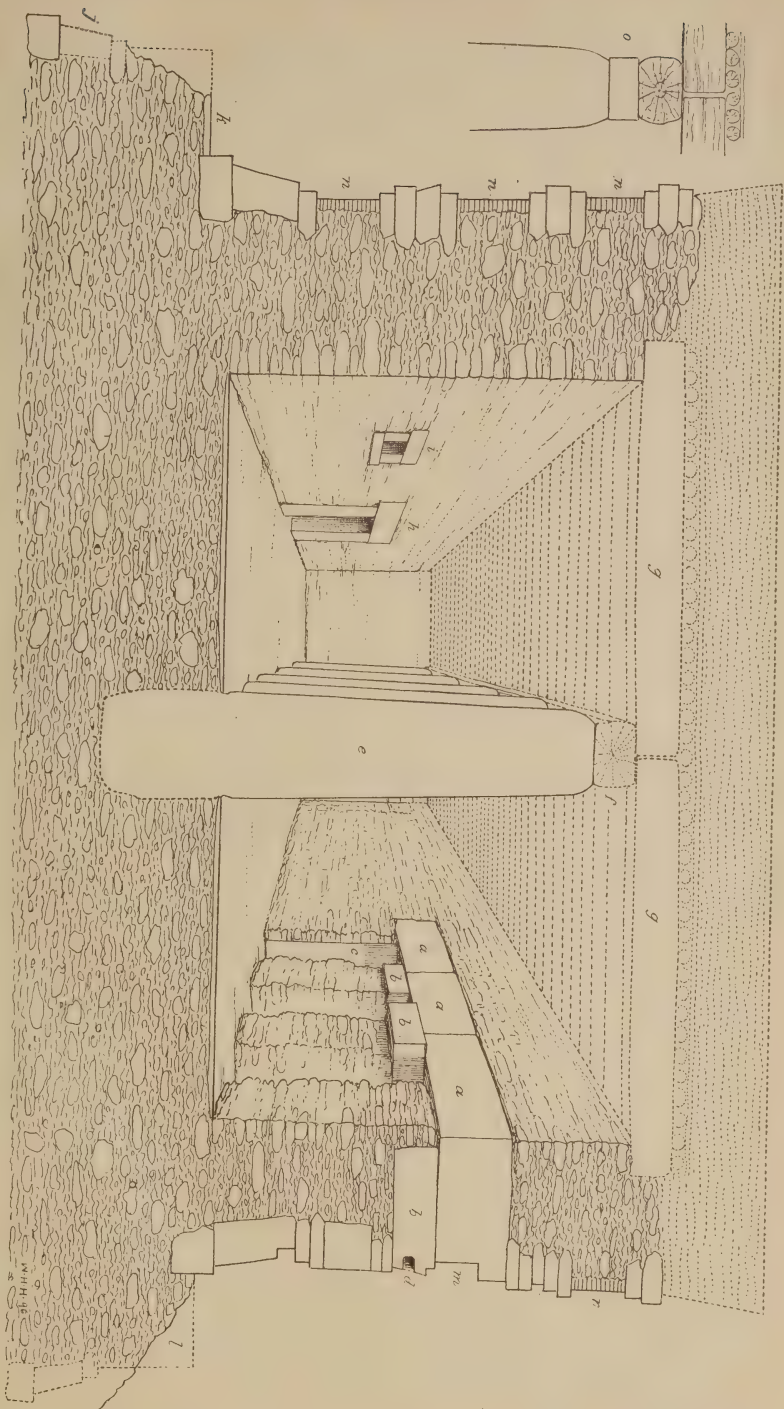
SECTION AND PERSPECTIVE OF THE HALL OF THE SIX COLUMNS; LOOKING EAST.
